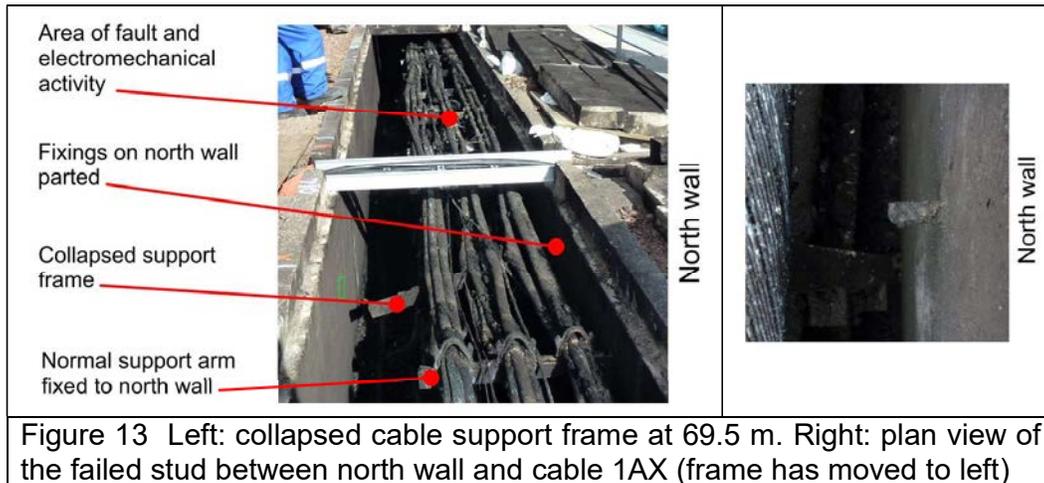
Left: collapsed cable support frame at 69.5 m. Right: plan view of the failed stud between north wall and cable 1AX (frame has moved to left)
